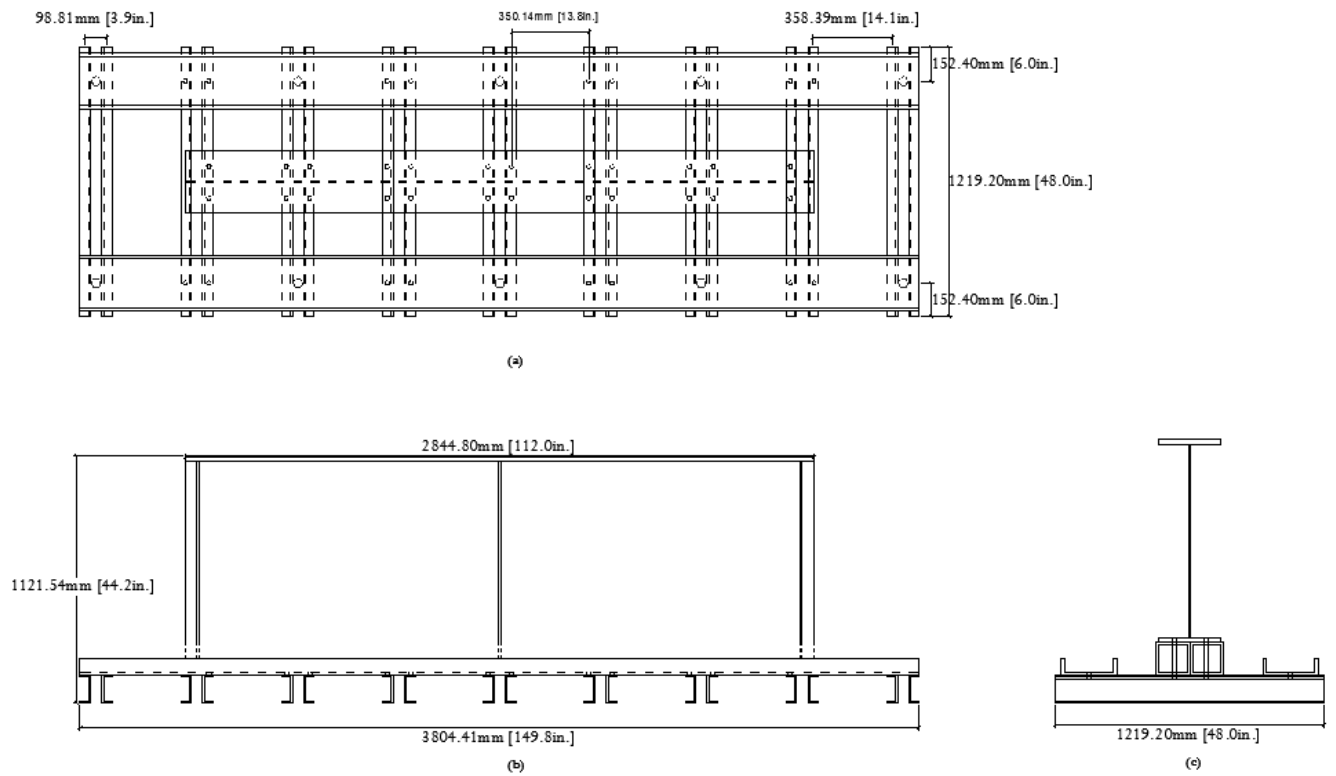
Floorbeam tie down system : a) Plan view b) Elevation view c) Section view
